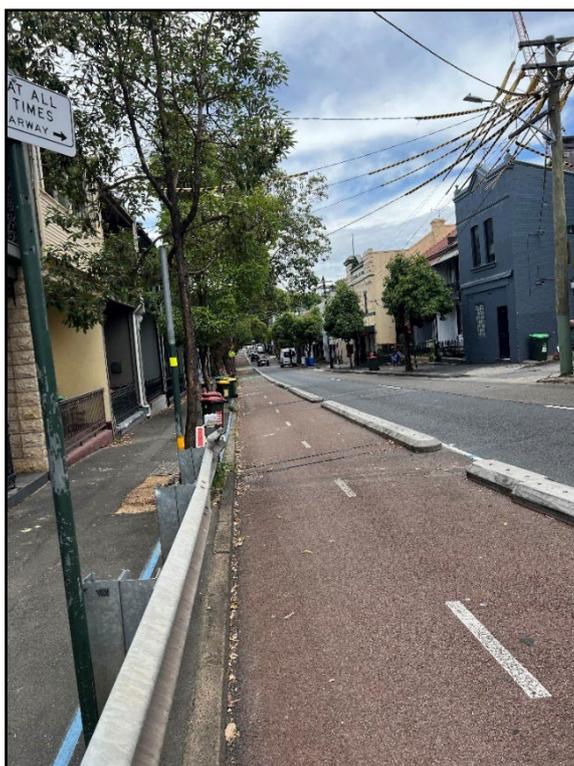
View looking west opposite Oatley Road, where the cycleway becomes a shared path for a short distance across this intersection.
